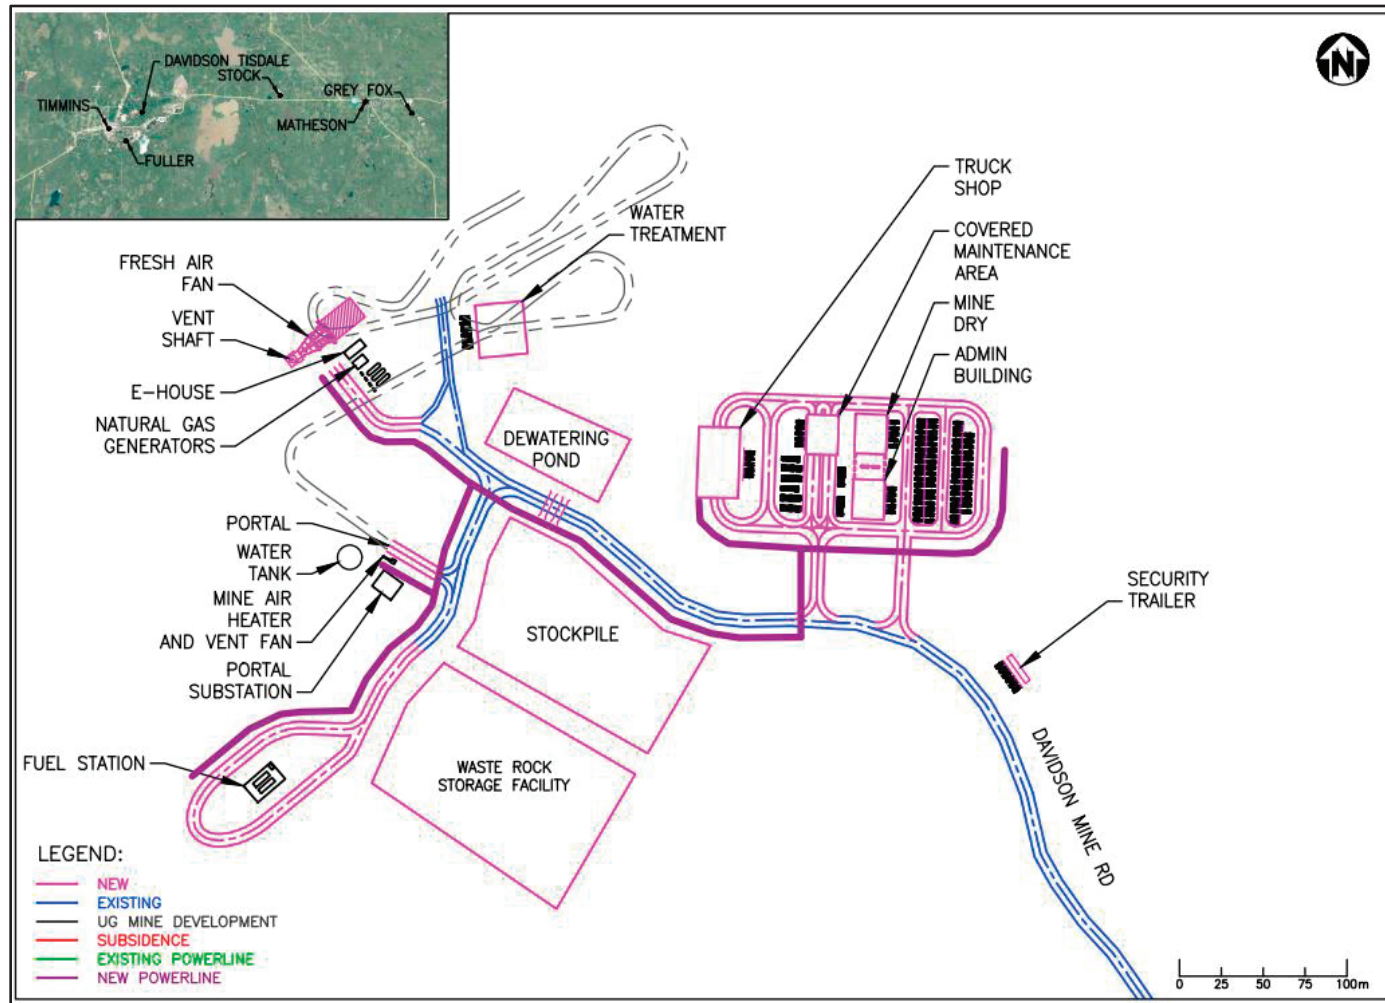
Fuller Site Layout (prepared by Wood, dated 2021)
